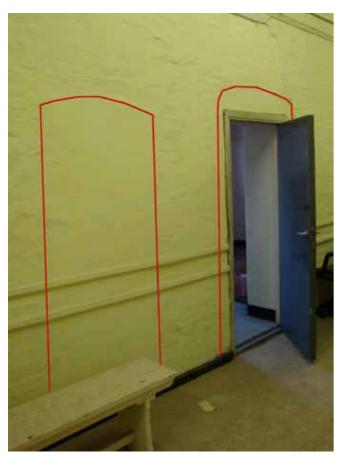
The north corridor wall of the east wing ground floor showing blocked openings outlined in red
